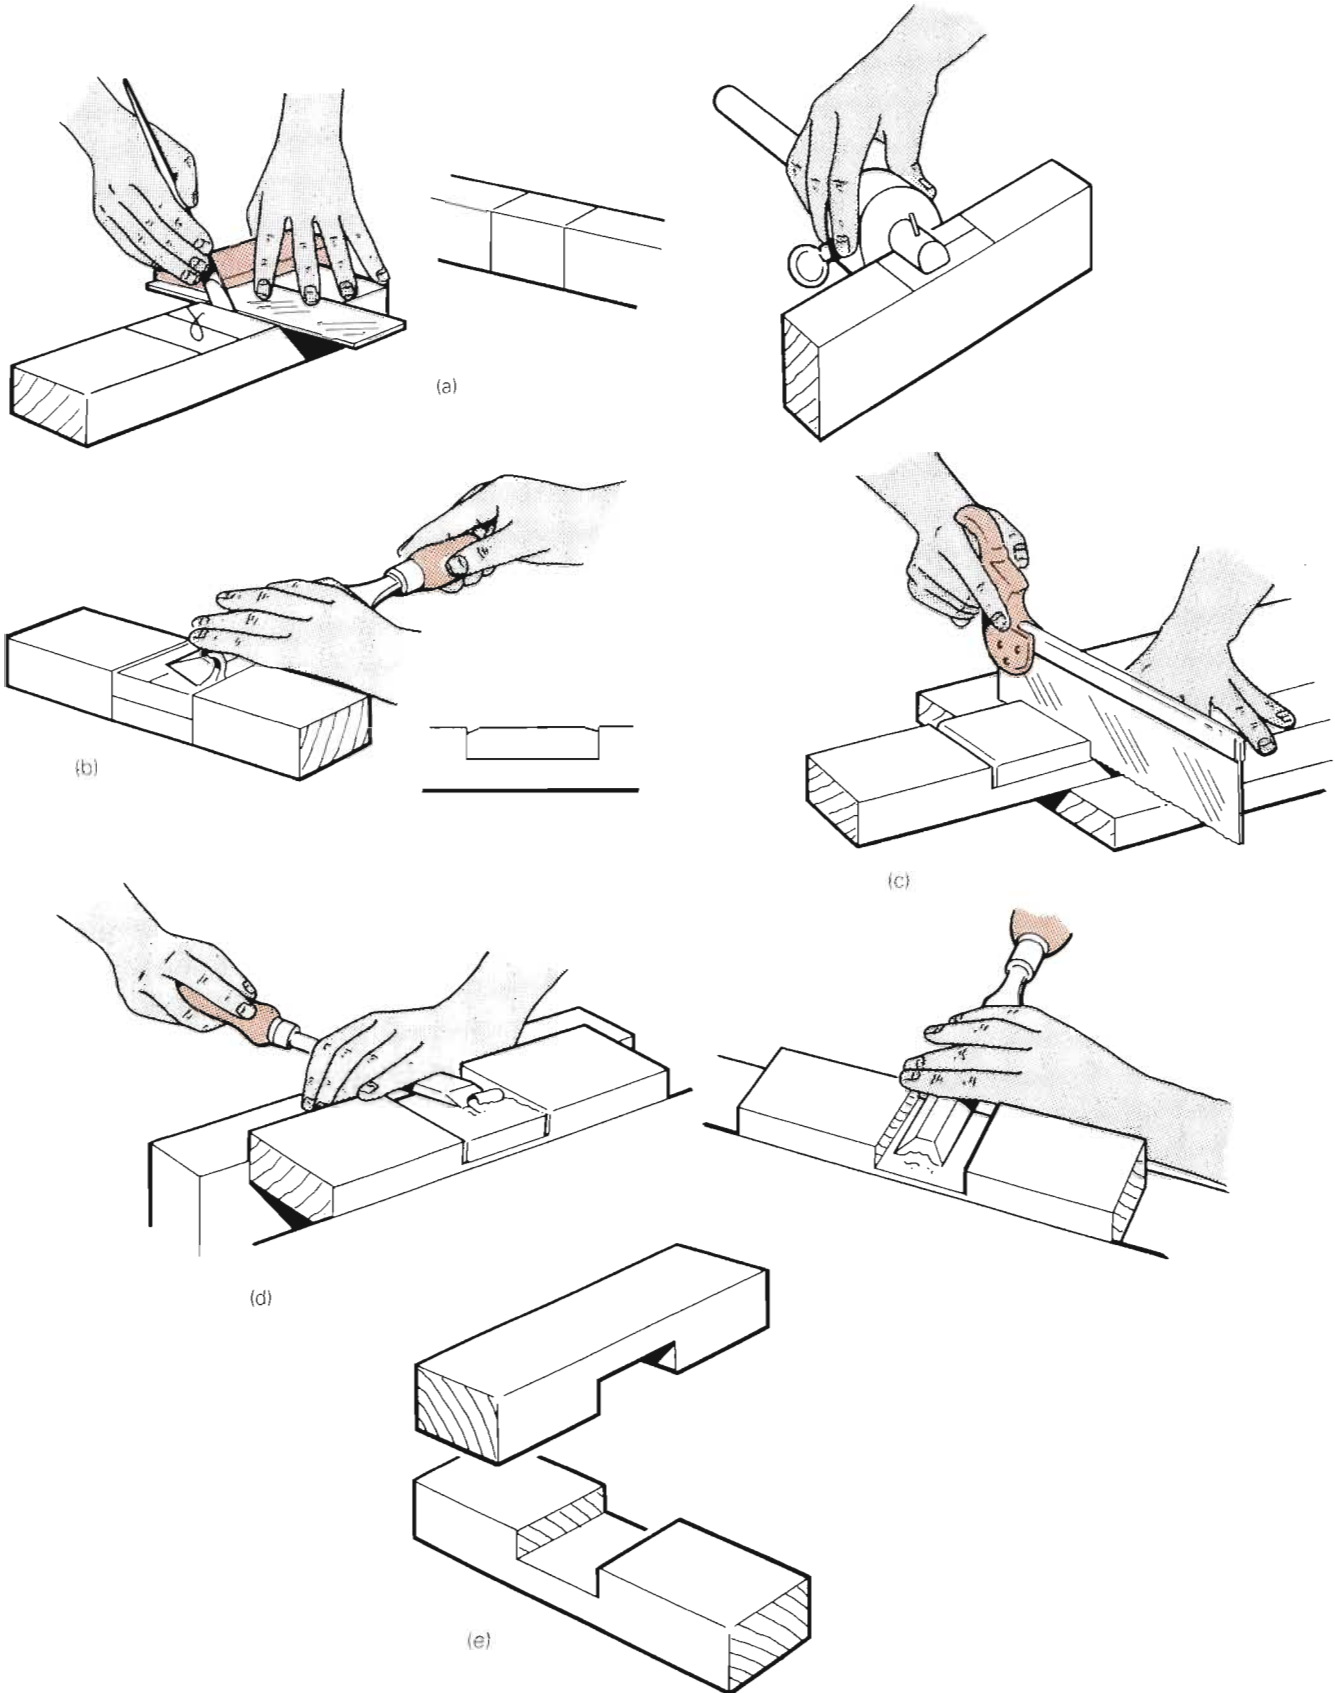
Preparing a cross-halving joint: (a) mark out, (b) make a sloping groove, (c) cut the sides, (d) remove the waste, (e) assemble.
